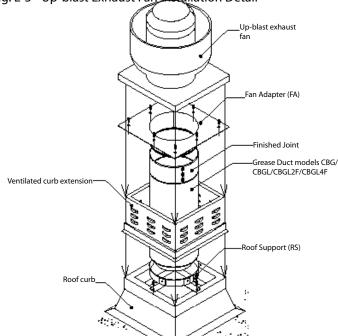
Up-blast Exhaust Fan Installation Detail
